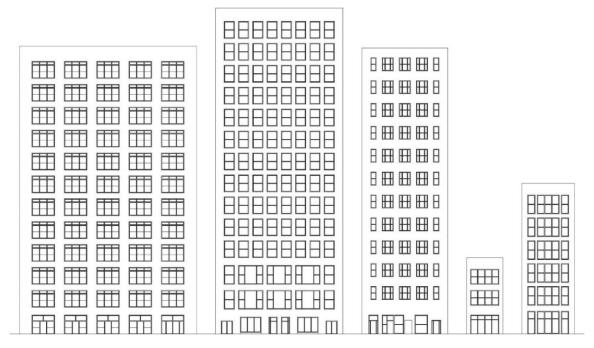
Street-front elevations of Buildings 16–20. 1" = 32'.
